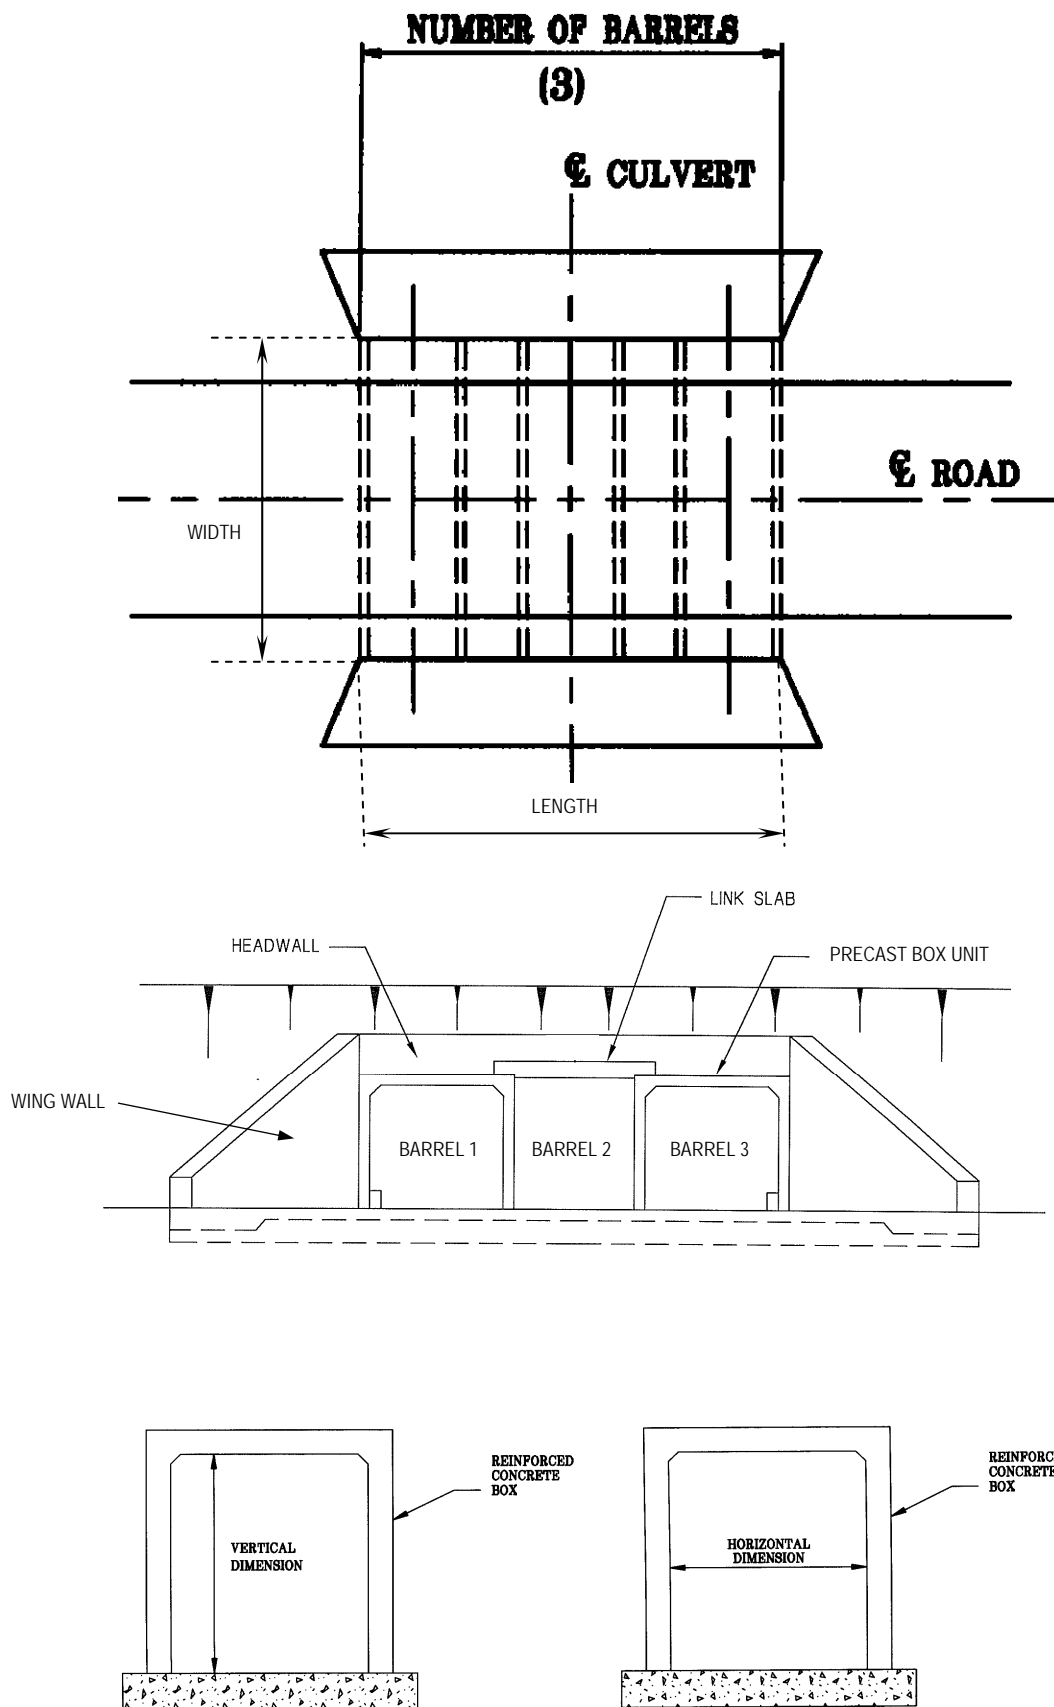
TYPICAL NON-TIMBER BRIDGE STRUCTURE COMPONENTS
